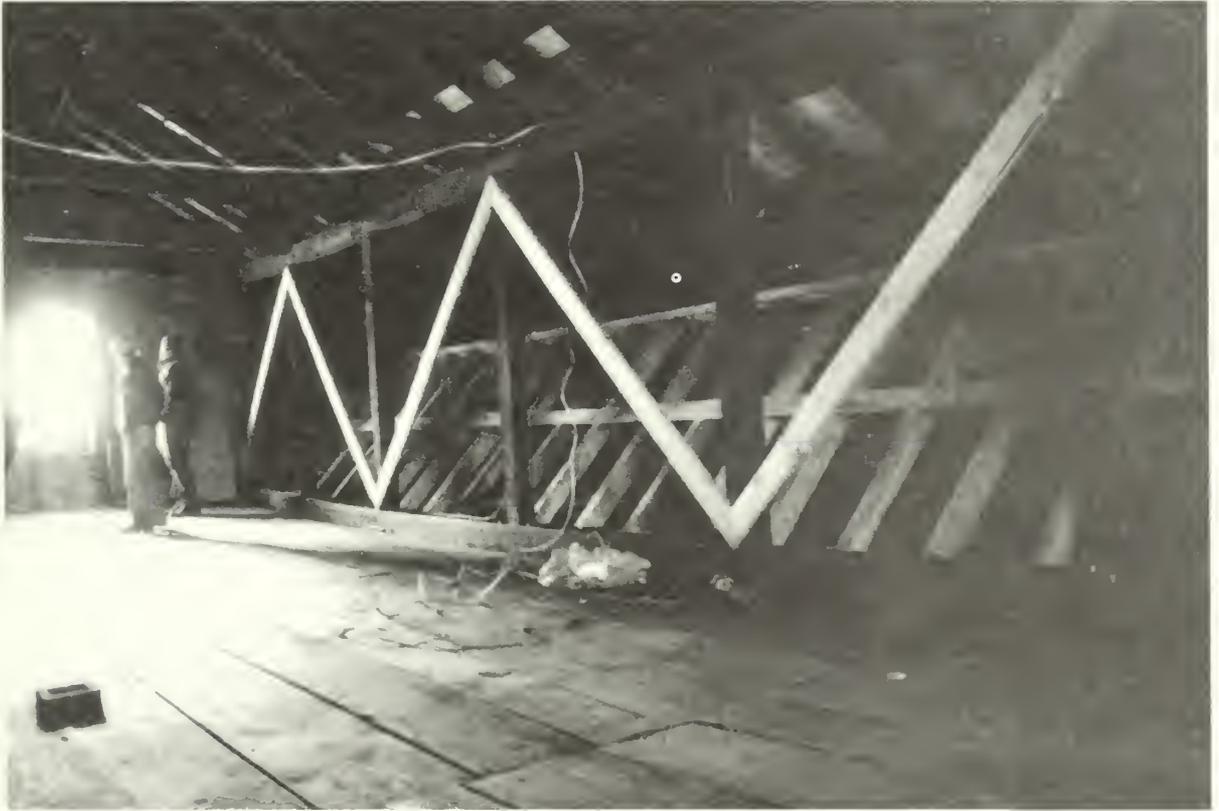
Southeast Room-Second Floor (5/20/82): This area of the second floor has witnessed the most extensive change over the life of the building--see "Historical Data" section. The project treatments focused on removal of intrusions (1930s electrical fixtures) and the reestablishment of structural integrity at the attic floor beam and support post. The 6 x 6 support post shown here, installed at an unknown date, was not located above the support post below and required the diagonal brace to assist in carrying the beam splice above. This had not proven totally effective as the beam has cracked and the splice has fractured.
